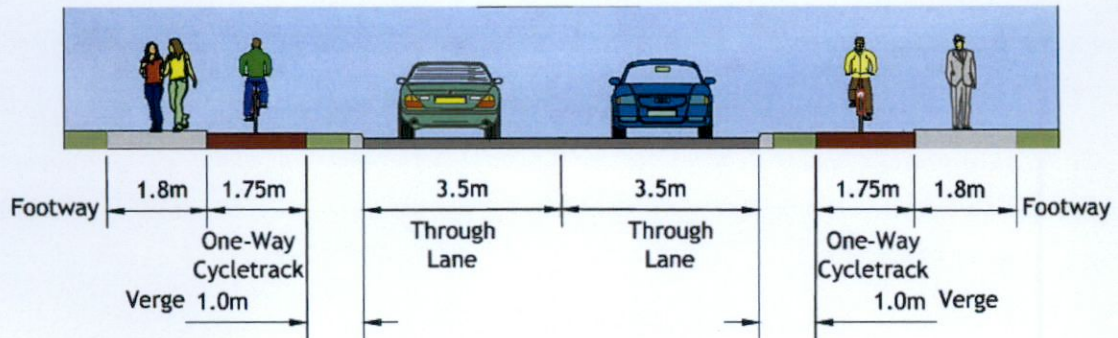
Typical Cross Section of Potential Future Option 2 Through Road Connection (Section B and Section C) via the Subject Development Site (Extract of DBFL drawing 210175-DBFL-TR-SP-DR-C-1120)
